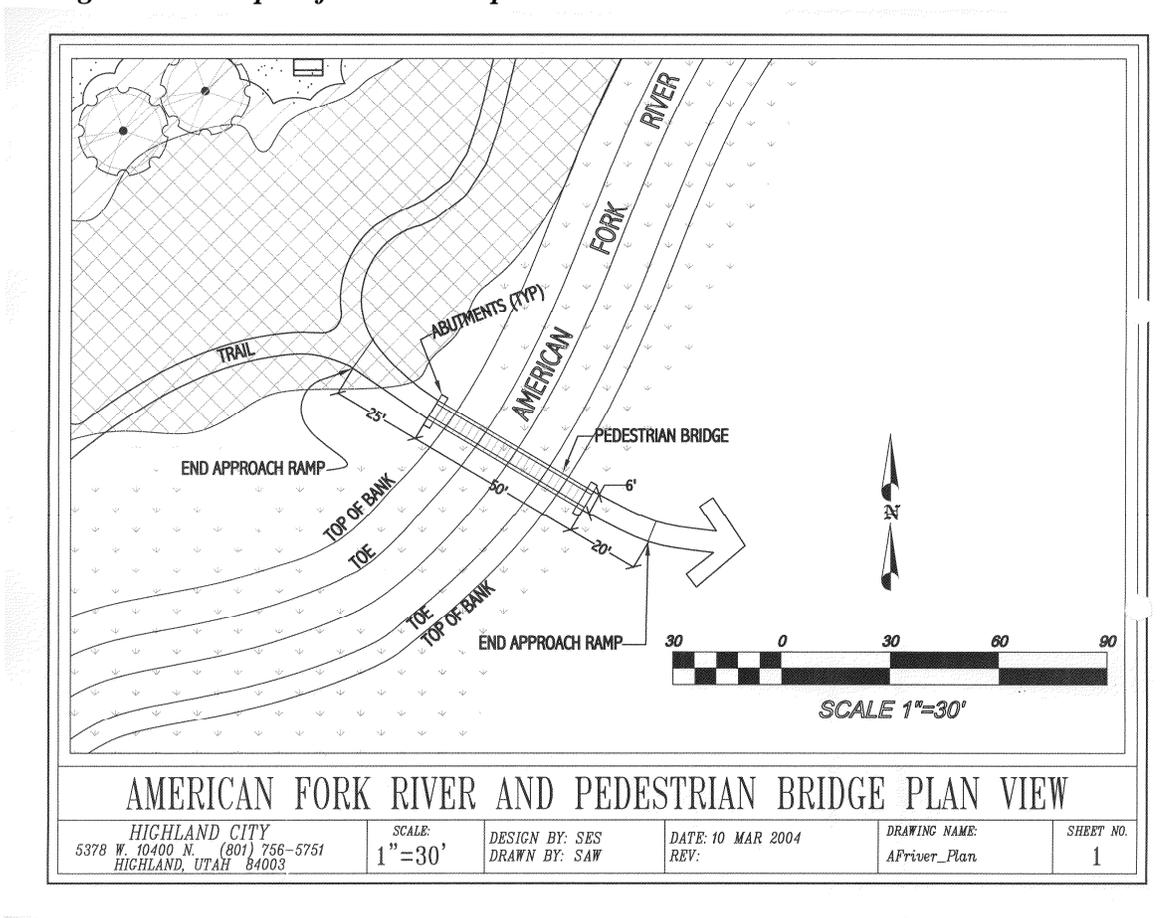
Example of plan view drawing submitted for pedestrian bridge crossing
